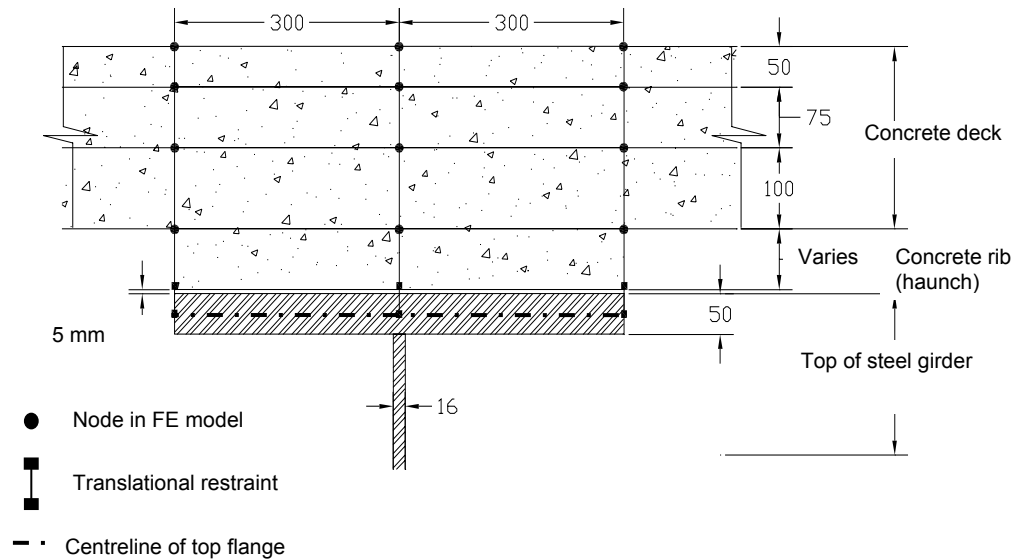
Constraint between a girder's top flange and the bottom of concrete deck (all dimensions are in mm).
